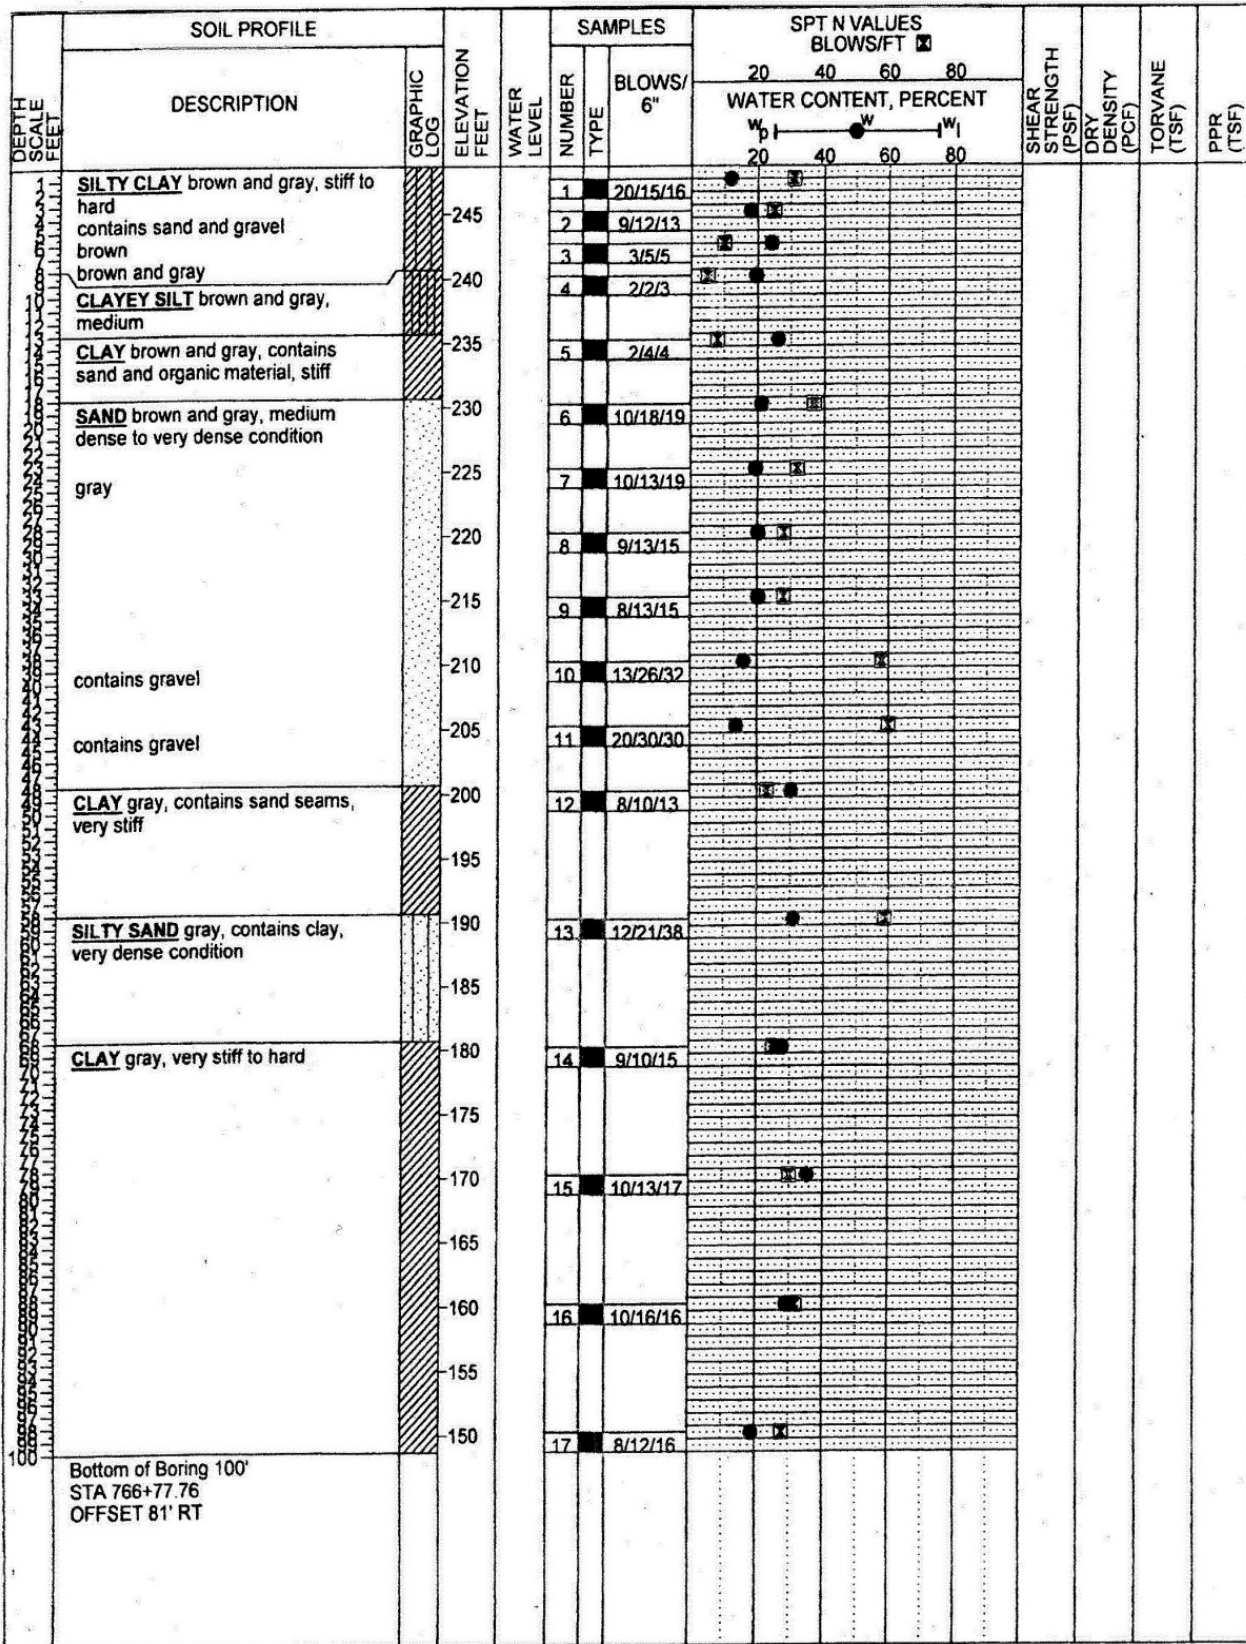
Soil profile at the site of the office building (courtesy of Geotechnology, Inc).
